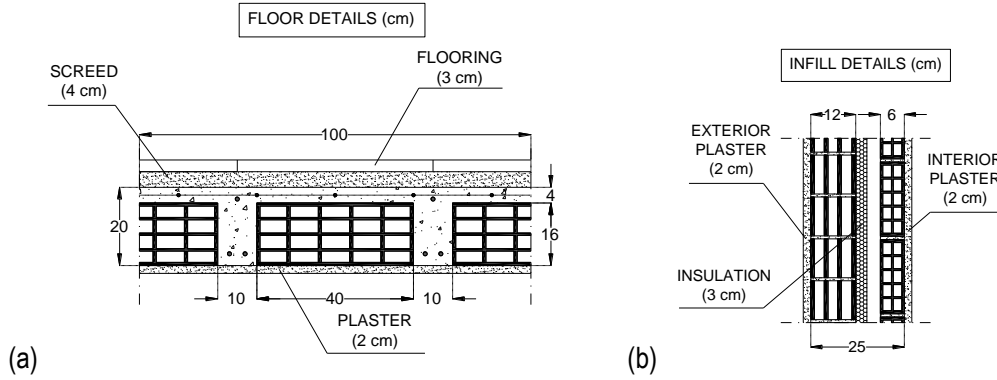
Geometrical details of the benchmark building: (a) floor and (b) perimeter infill wall composition.
